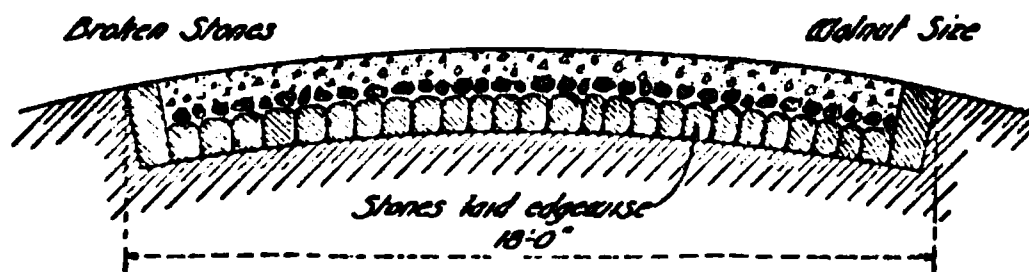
Cross-section of French Road Built by Tresaguet.
